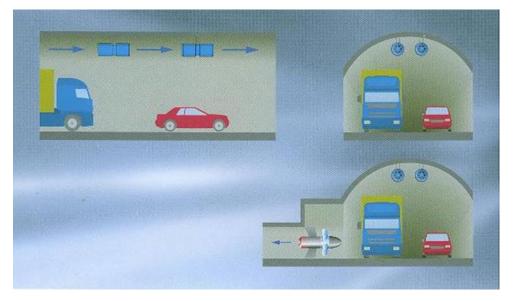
Indicative Longitudinal Road Tunnel Ventilation System
